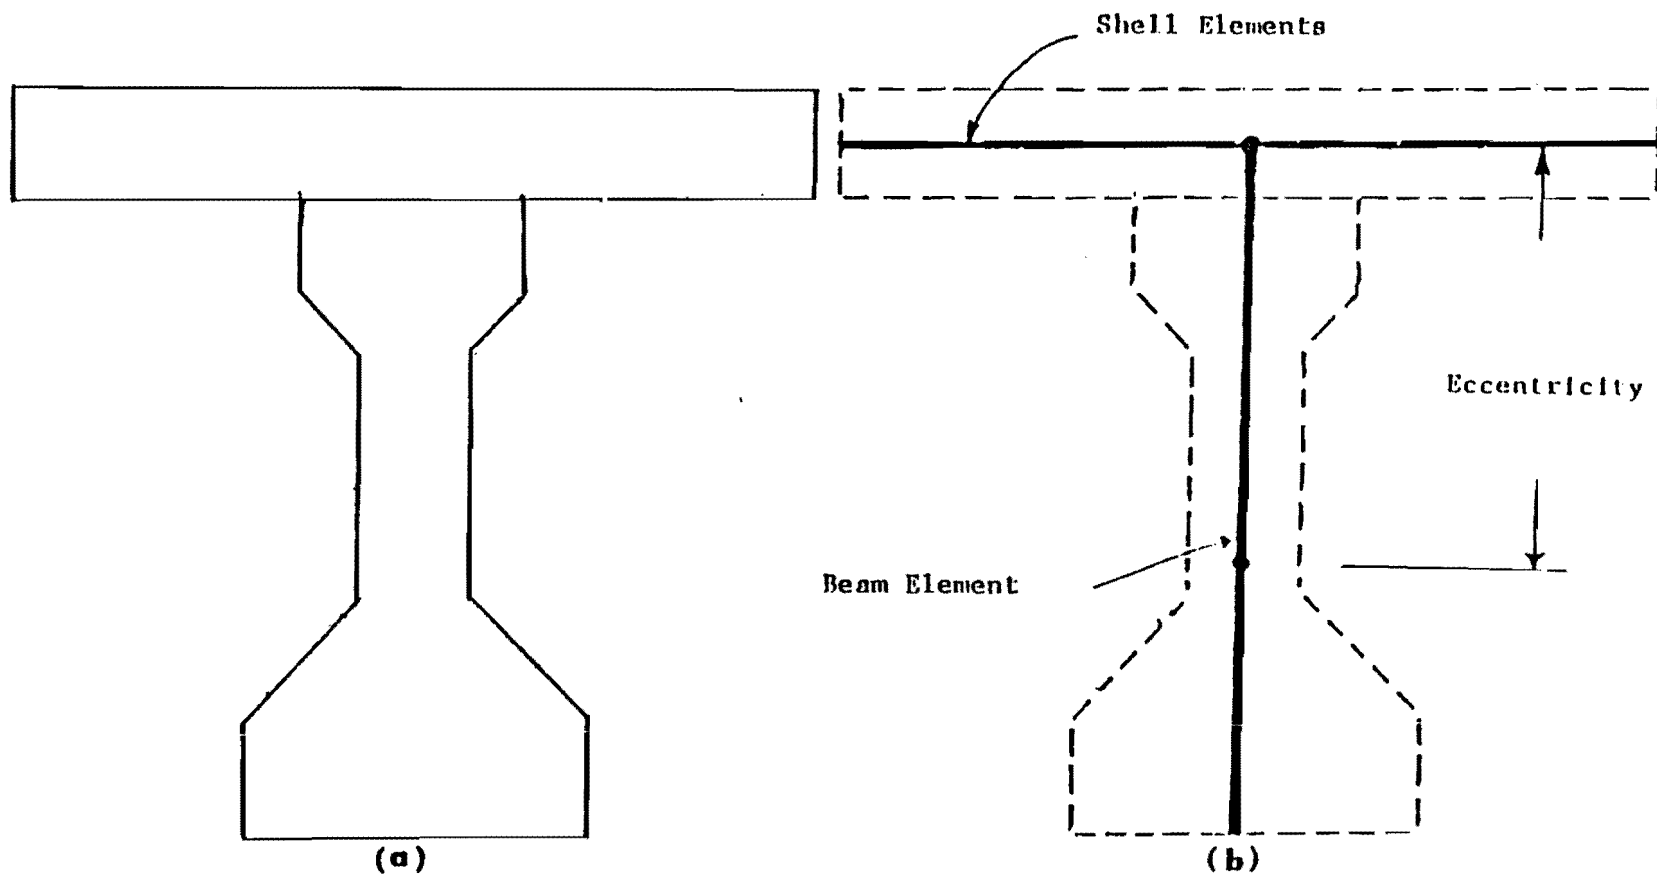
The actual girder-slab connection (a) vs modeled connection (b)
